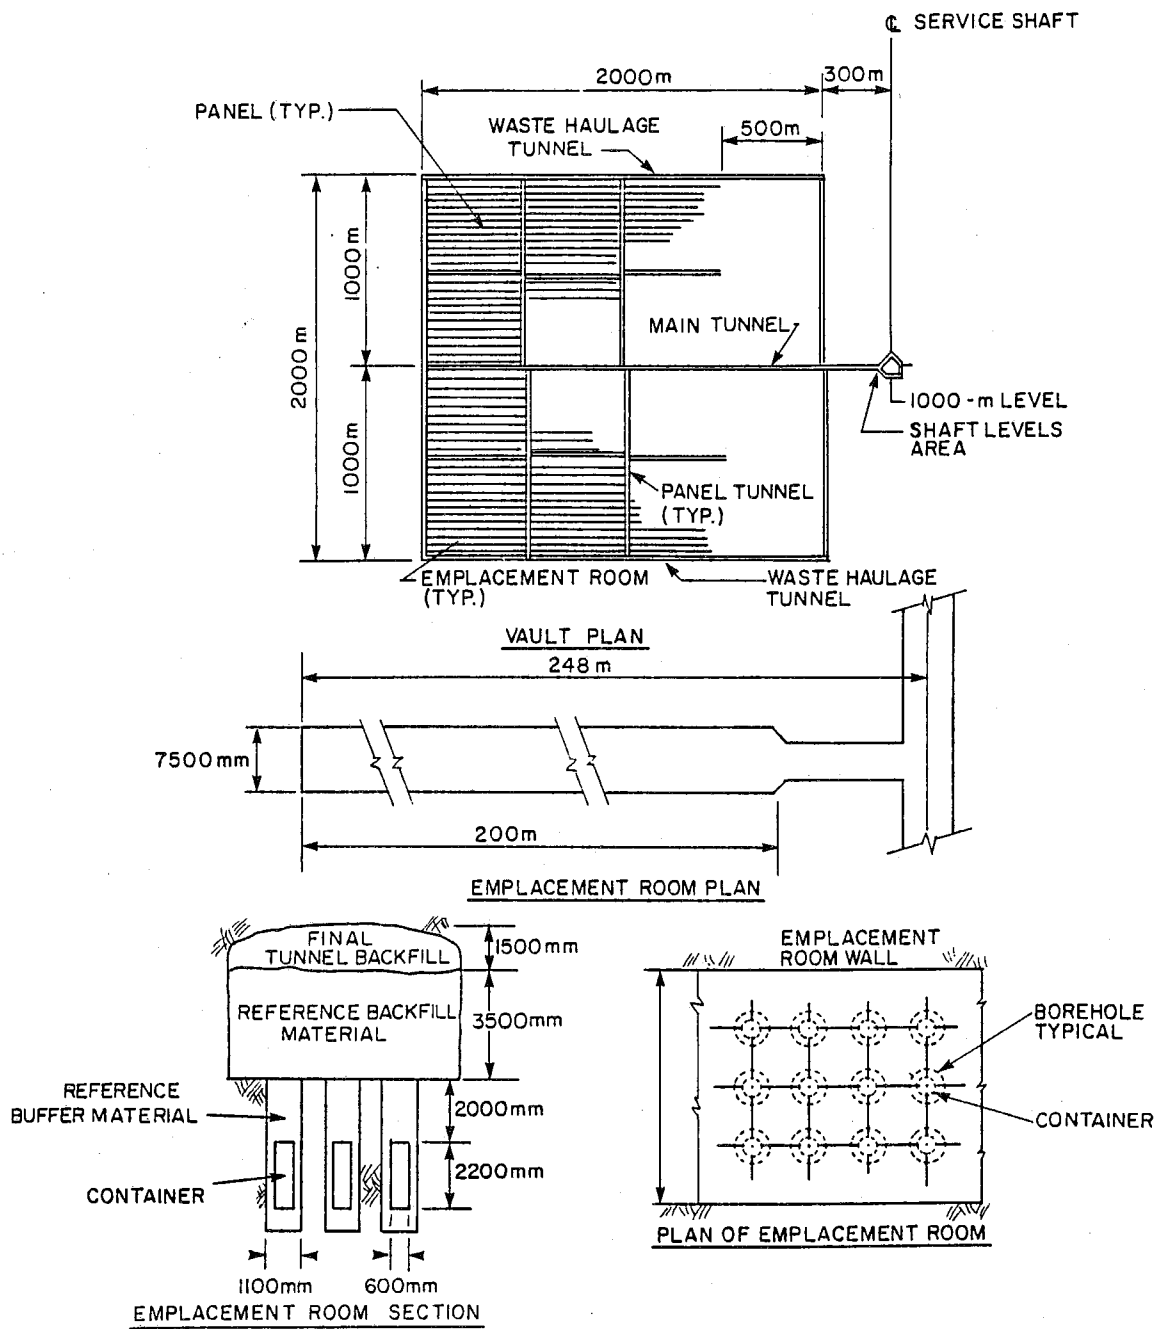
Reference Layout and Design for a Single-level Disposal Vault
